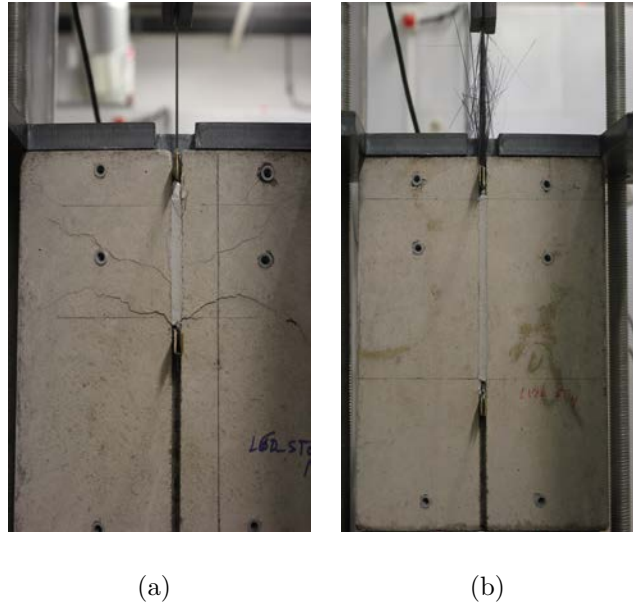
Failure modes (a) Concrete failure ( $L_b=60$  mm) and (b) CFRP rupture ( $L_b=90$  and  $120$  mm).
